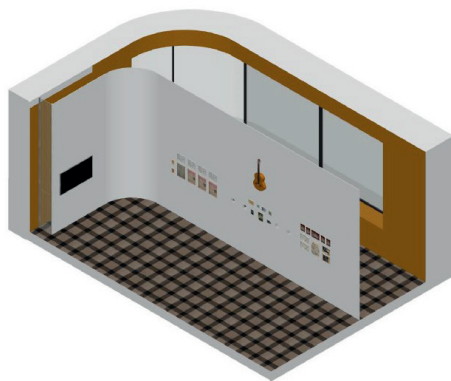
Sketch of the exhibition hall interior. New internal walls with frame structure. IMPLMNT Architects, 2022
